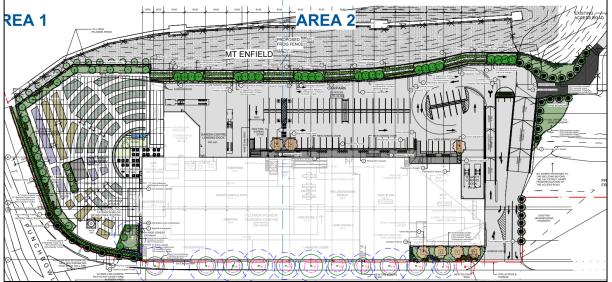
Extract of the landscape plan prepared by Site Design Studios, dated 23 August 2022.
